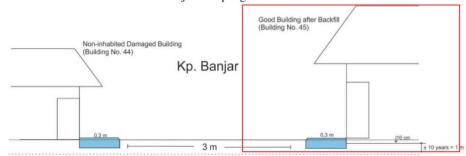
Spatial expression of good building after backfill (Source: direct observation, 2019)
